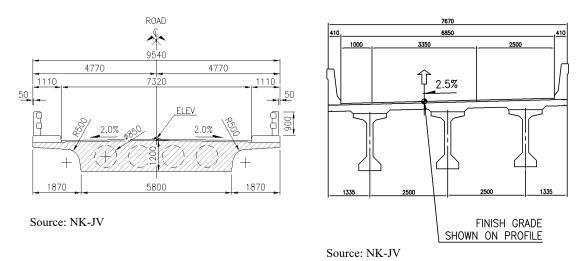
Typical Cross Section of Overpass Bridge
